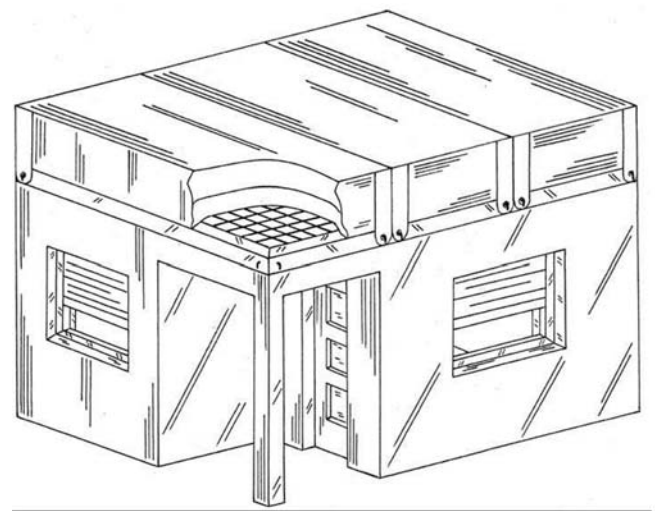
General drawing of the new multiple-chamber water roof. Note that the metallic roof has been substituted by a metallic open mesh structure.
